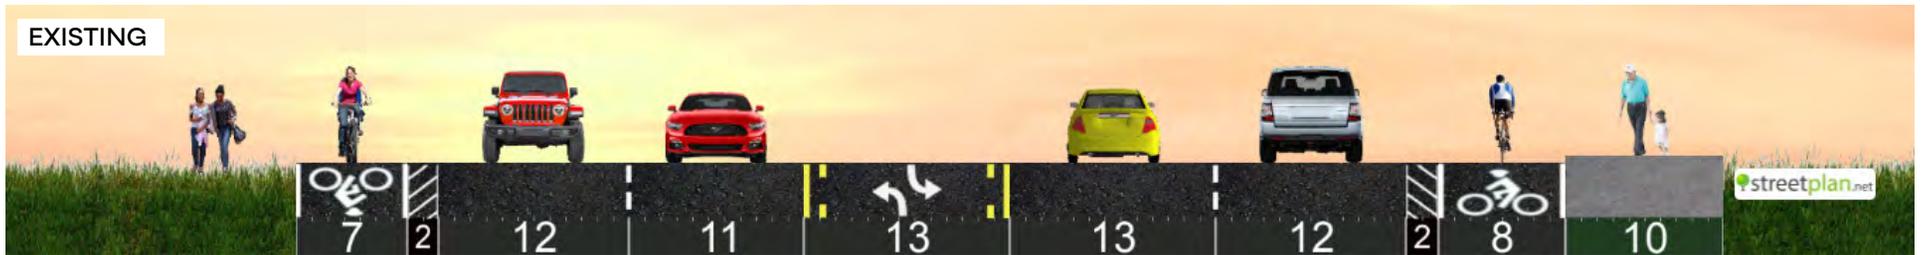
Existing Conditions: LOVR between Sunset Drive and Fairchild Way
